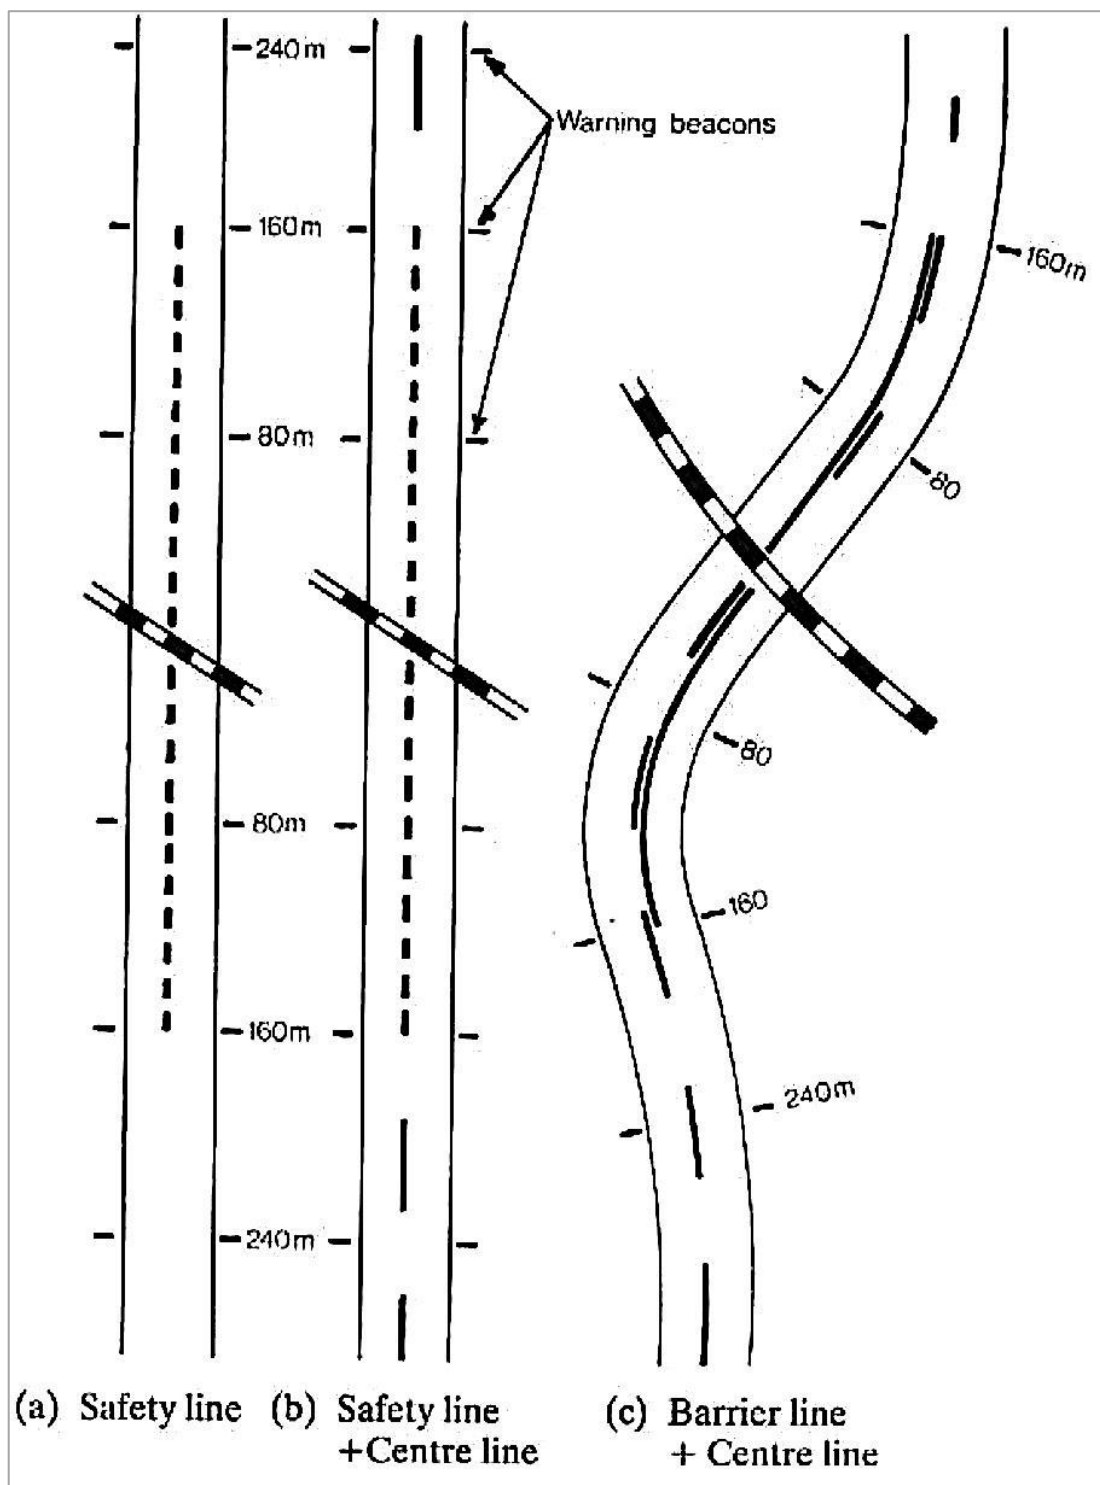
/19: Marking of railway crossings [4, p.V-27]
